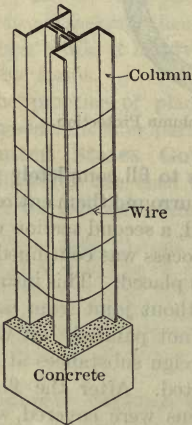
Concrete Column Coverings used in San Francisco Buildings.
